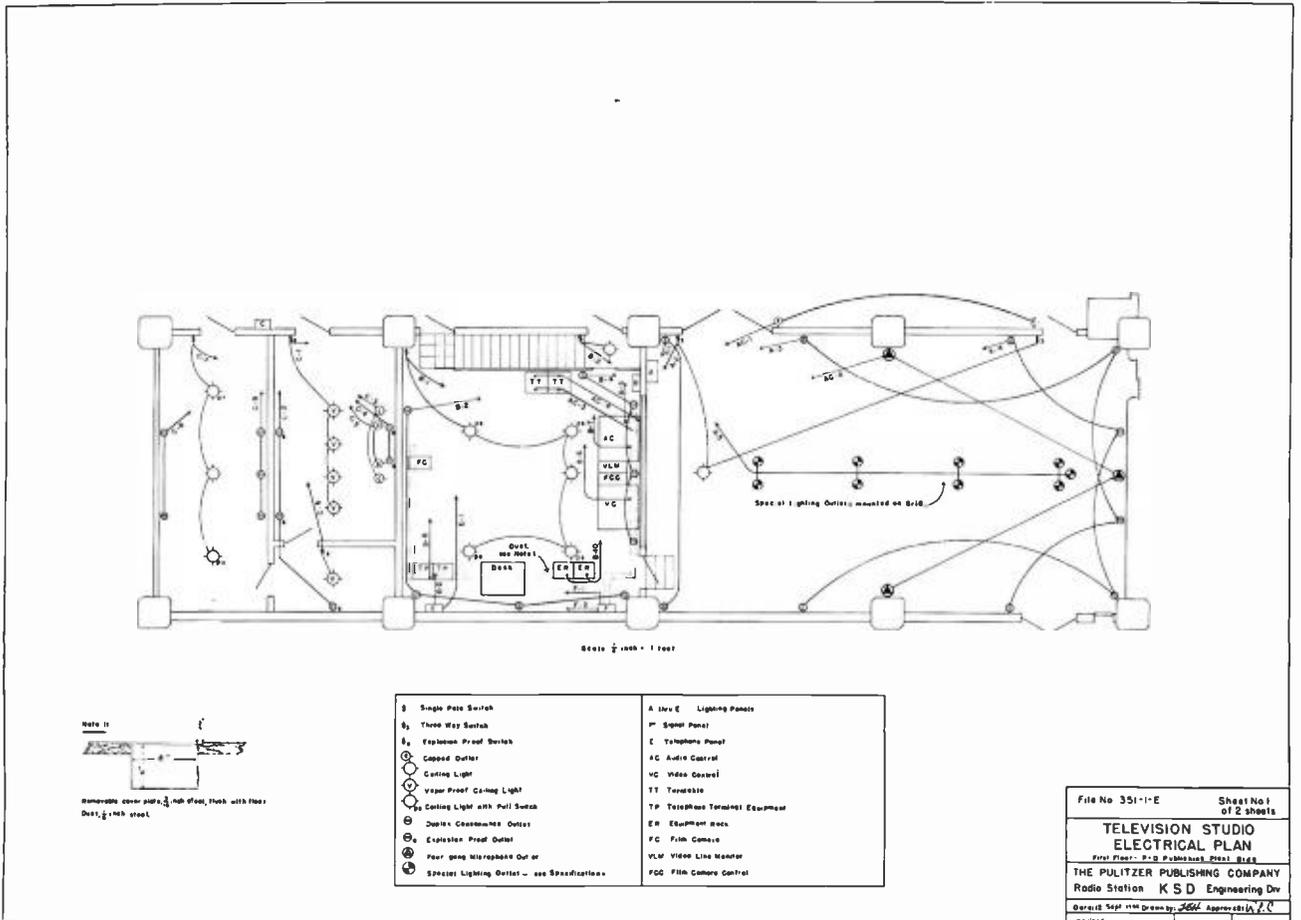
Floor layout of KSD-TV's temporary setup showing, left to right, the workshop, telefilm room, control room, and studio proper. Location of main equipment items, outlets, and connections is indicated by symbols which are identified in the legend.
